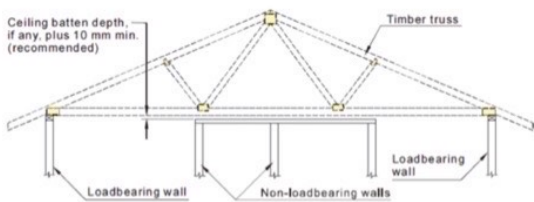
LOADBEARING AND NON-LOADBEARING WALLS
